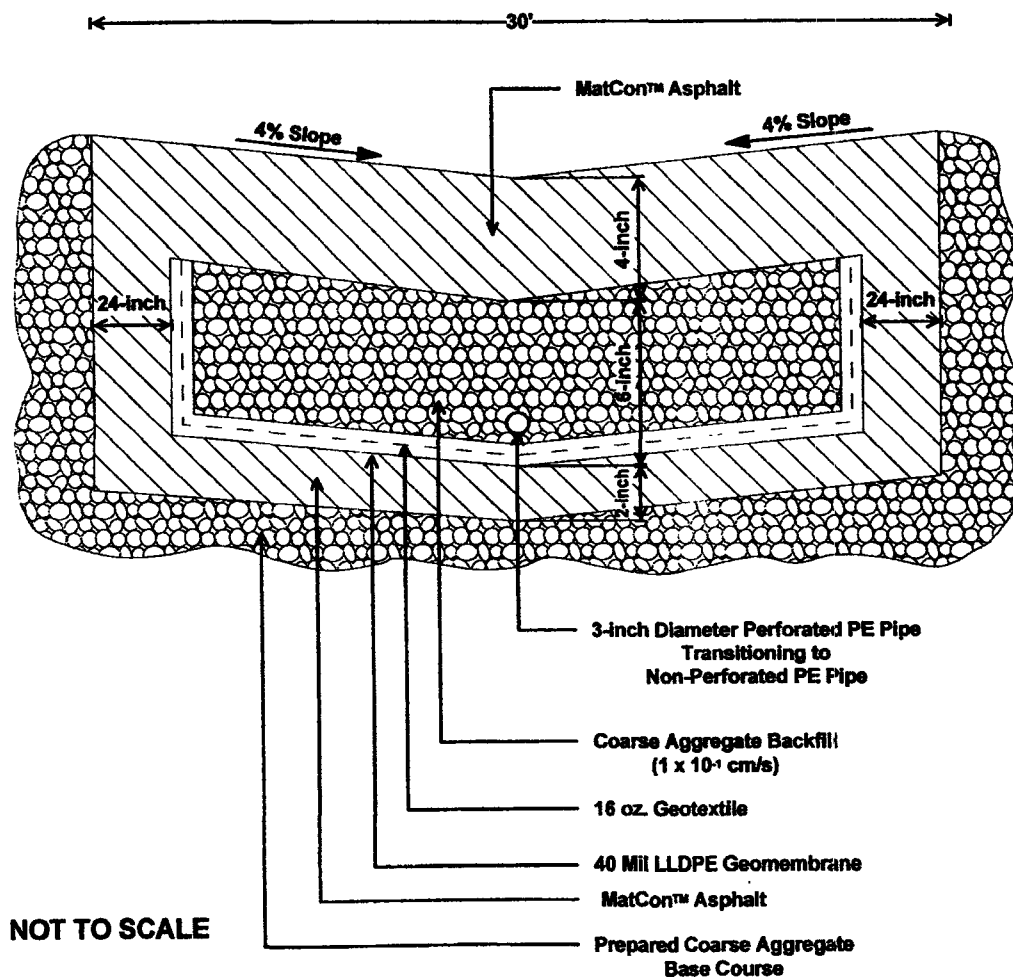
Section B - B' (from Figure 3) showing infiltration collection system at Tri-County Landfill.
